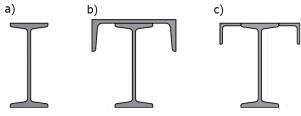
Examples of cross-section of the main girder and the reinforcement of the upper belt
